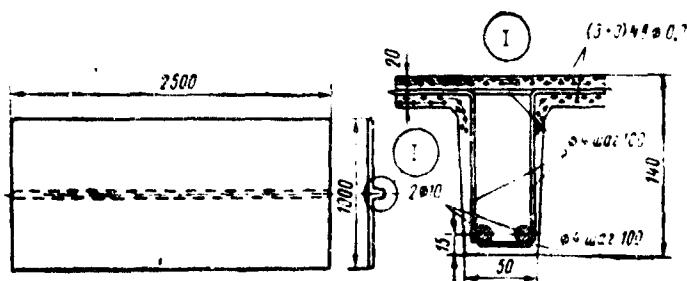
Design of Ribbed Plates, Reinforced by One Stiffening Rib. Key: a) diameter 4, spacing 100.
